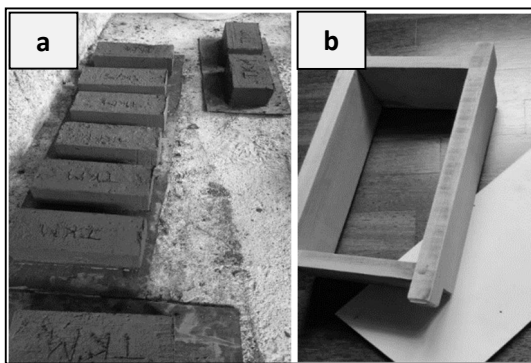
Moulding (a) Hand mould brick using Thamarachal clay; (b) Mould
